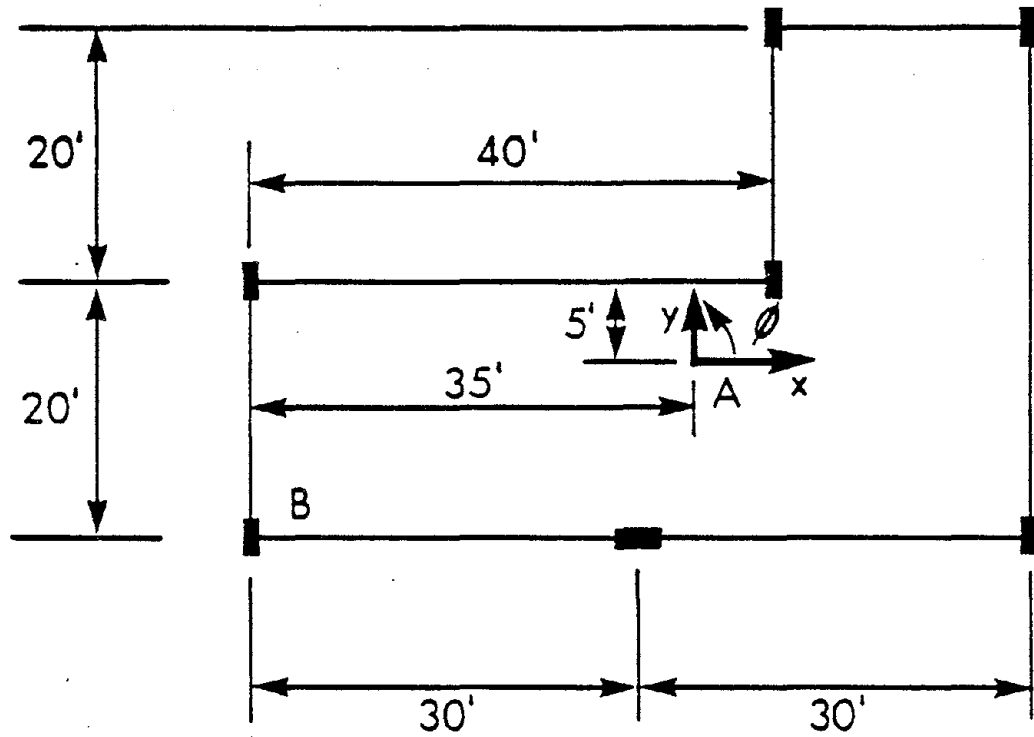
Five Story L-shaped Structure with Rectangular Columns - Plan
